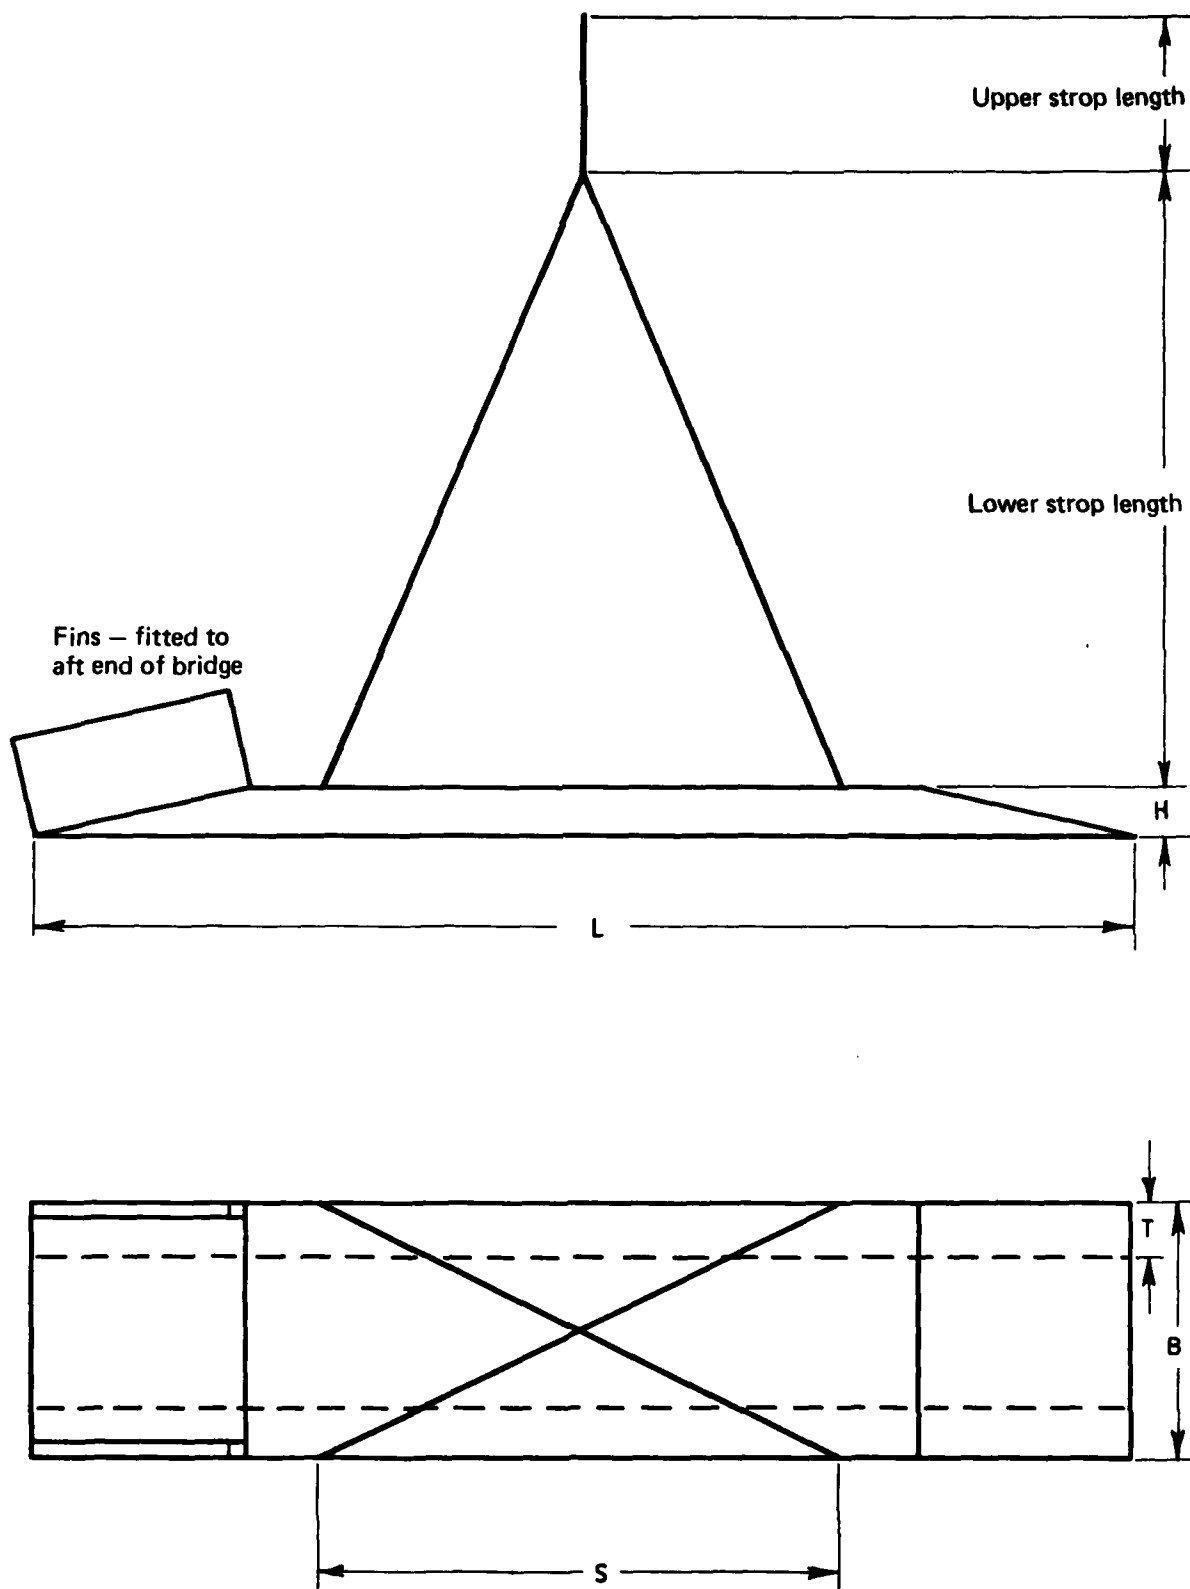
MODEL AND FULL SCALE BRIDGE DETAILS
